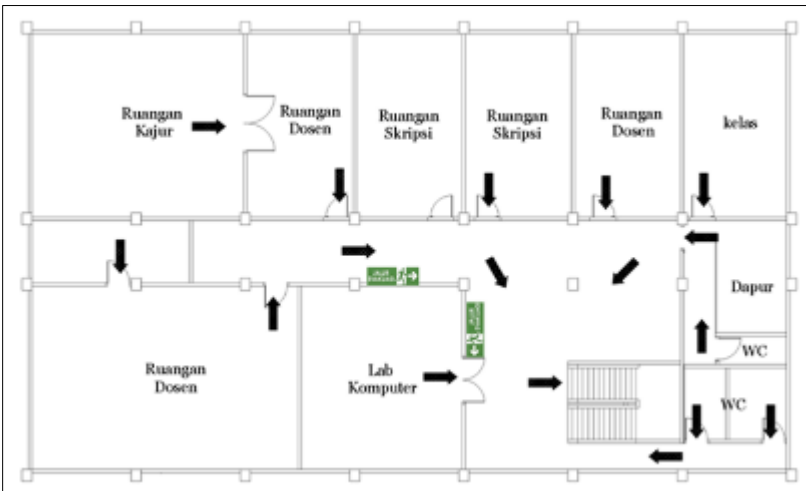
Evacuation Route for Civil Engineering Department, 2nd Floor
